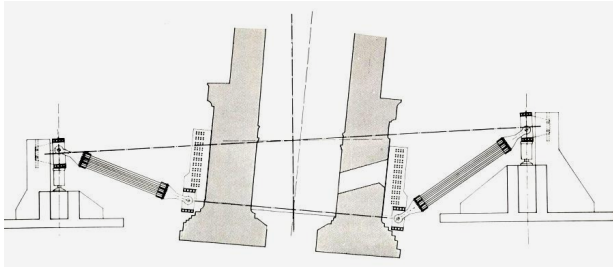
Device for lifting the Tower in order to allow the construction of a new foundation (Gustavo Colonnetti with Riccardo Morandi, 1963).
